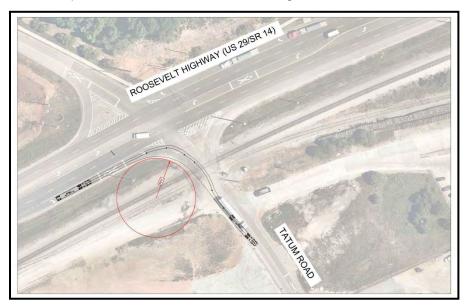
Roosevelt Highway (US 29/SR 14) at Tatum Road/Wilkerson Mill Road – Eastbound Right (Entering Truck)
